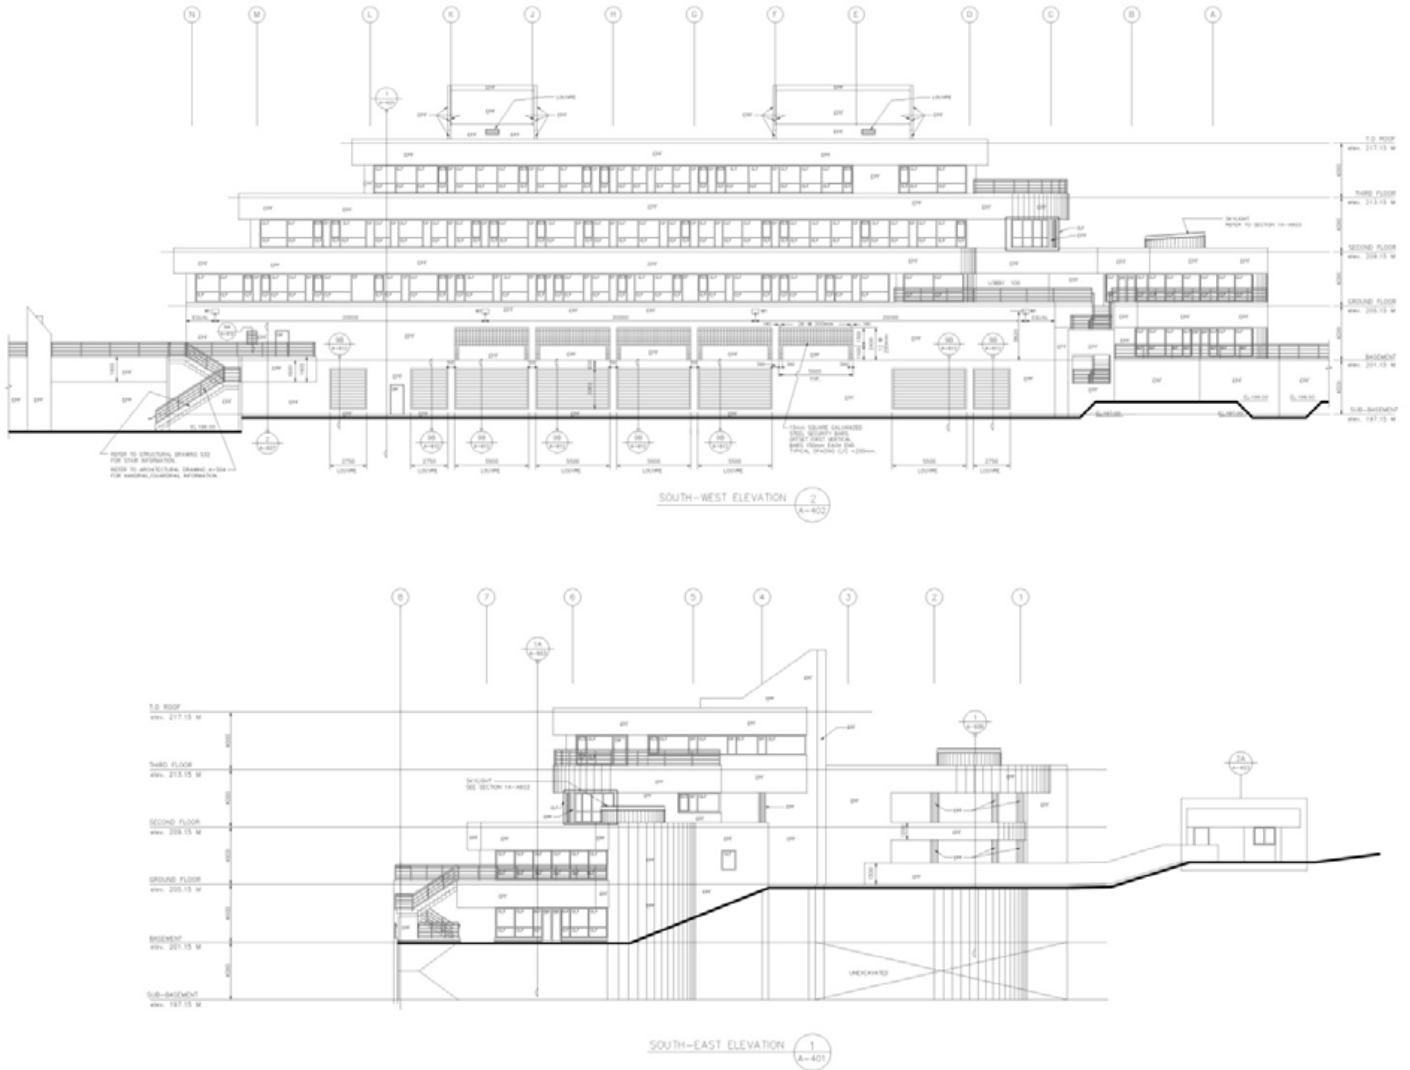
The elevations to which ‘general glazing’ requirements apply
